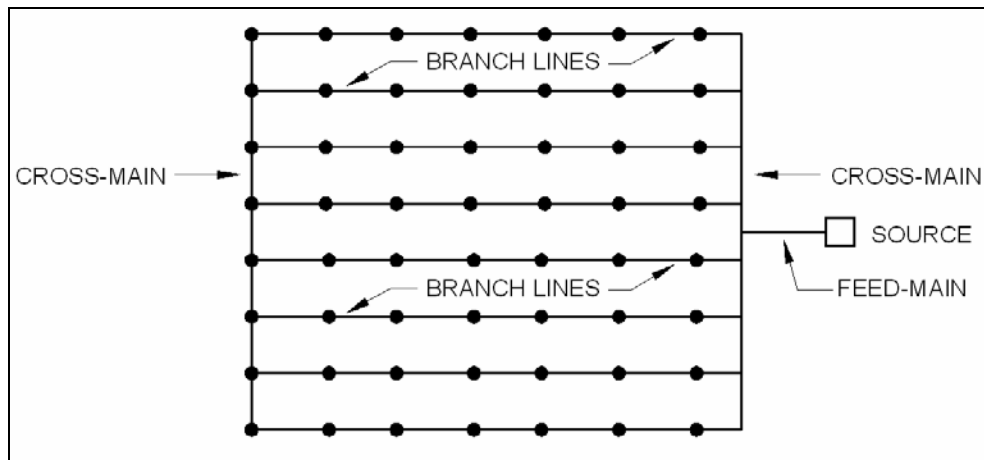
Typical Looped Sprinkler System (Plan View)
